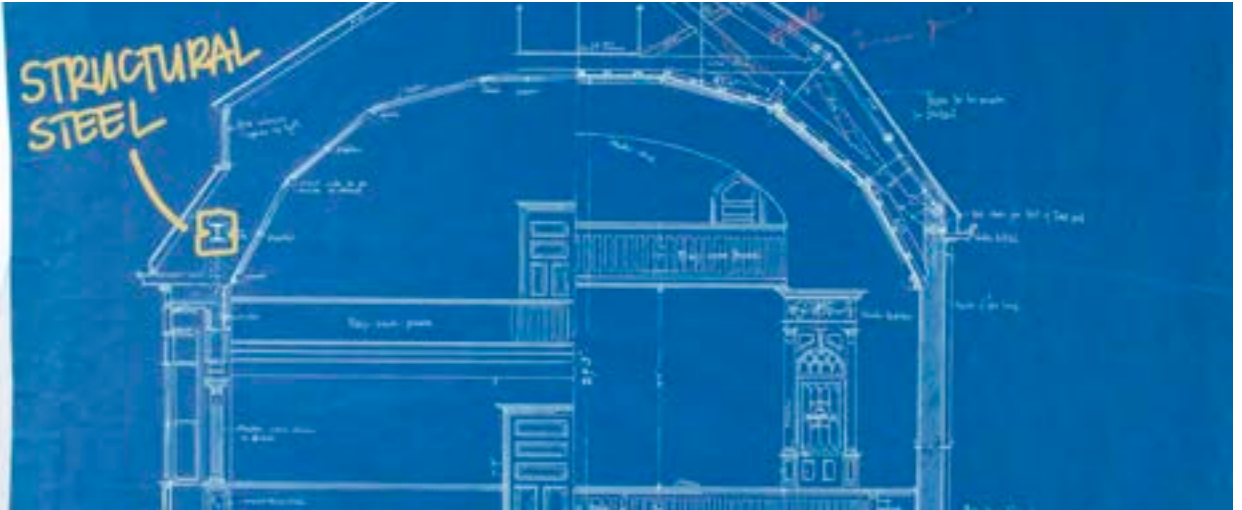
Structural Iron elements indicated on (1892 Section blueprints)
